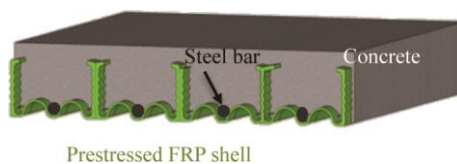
Prestressed BFRP–concrete composite bridge deck.
